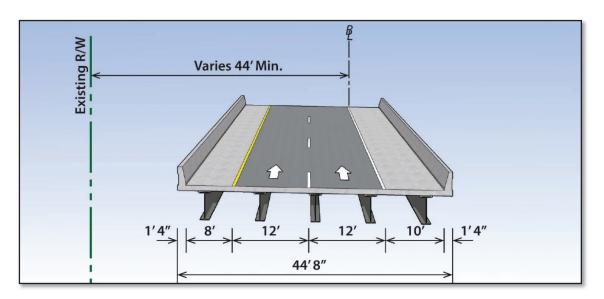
Proposed Typical Section – Florida Avenue Loop Ramp (On-structure)
